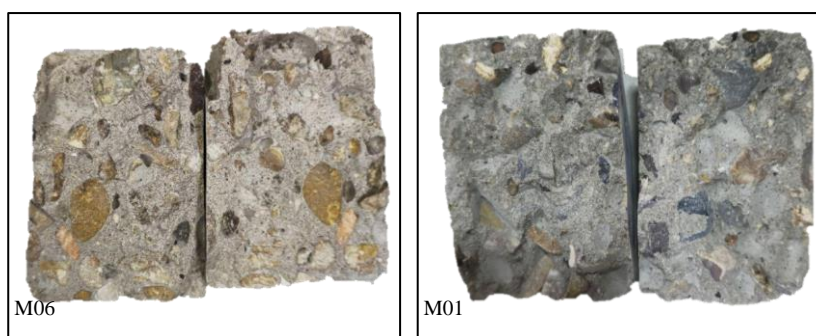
Fracture surface morphology after splitting tensile failure
